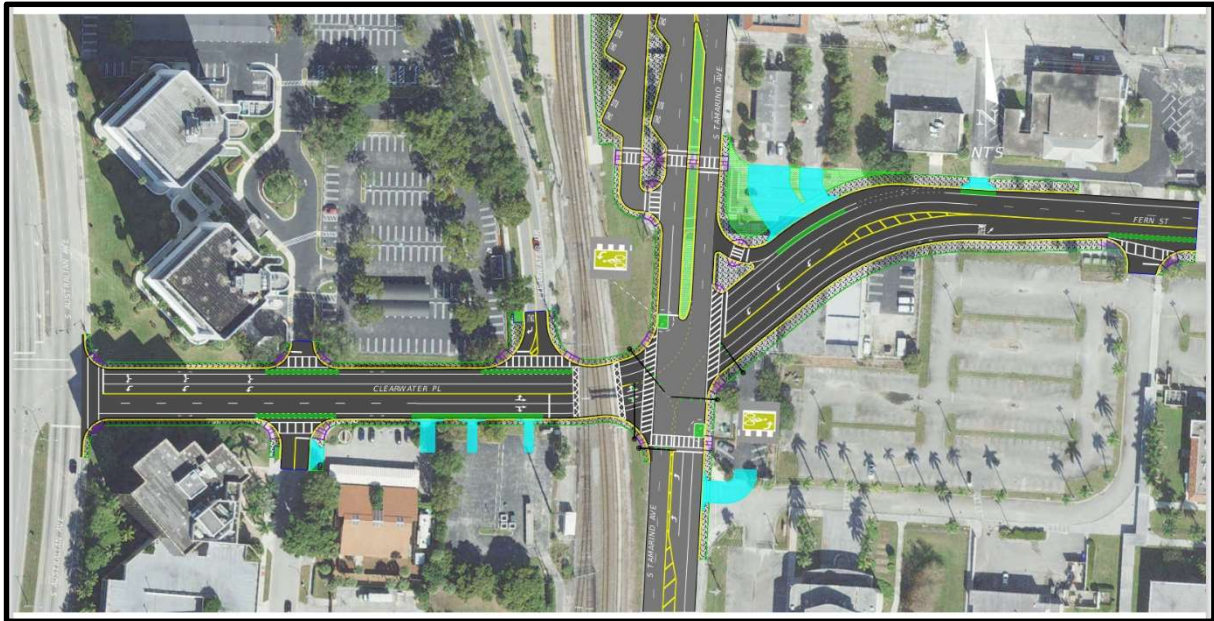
Conceptual Plan for Fern Street Alignment developed by HDR, Inc.
